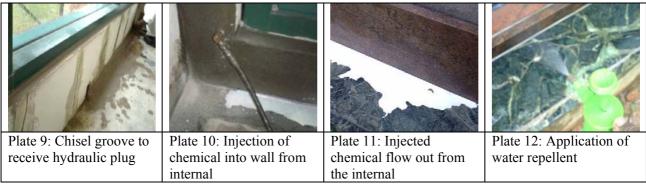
and 8 shows water intrusion through external wall. Plate 9 shows application of hydraulic plug to grooves to seal off large cracks. Plate 10 and 11 depict the injected chemical to penetrate the voids in the external wall and upon curing, forms a gel-like substance to achieve watertightness of wall. Plate 12 shows the last step of MPI to provide a second line of defense to the completed system.
